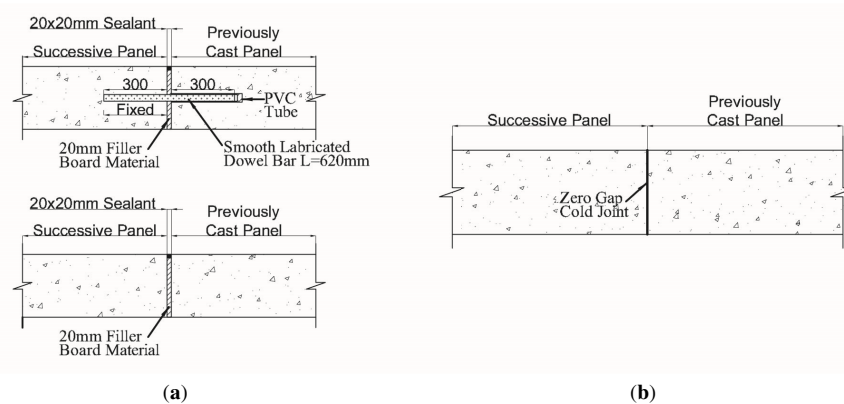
Typical joints of concrete structures: (a) expansion joint details with and without dowel bars [19]; (b) cold joints in the Tunnel #1 and Tunnel #2.
